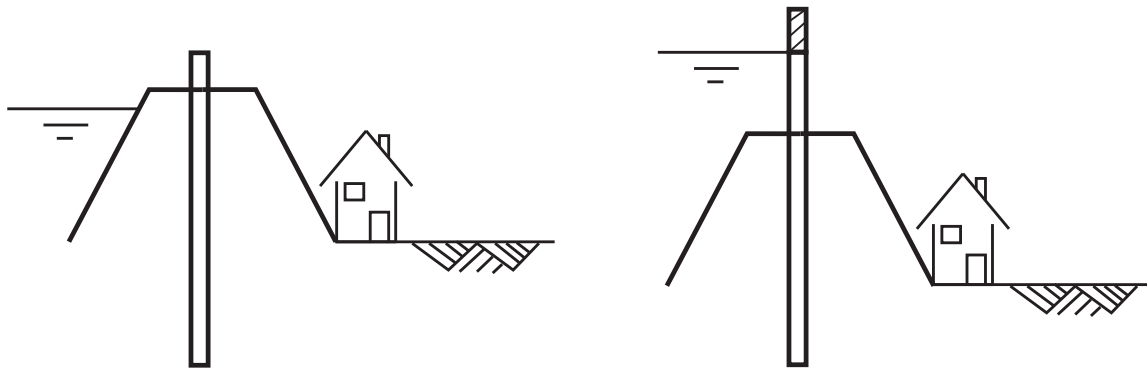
Option 5: Structural measure to increase retaining height with a building at toe of dike (L) and further increase due to SLR and subsidence (R).
